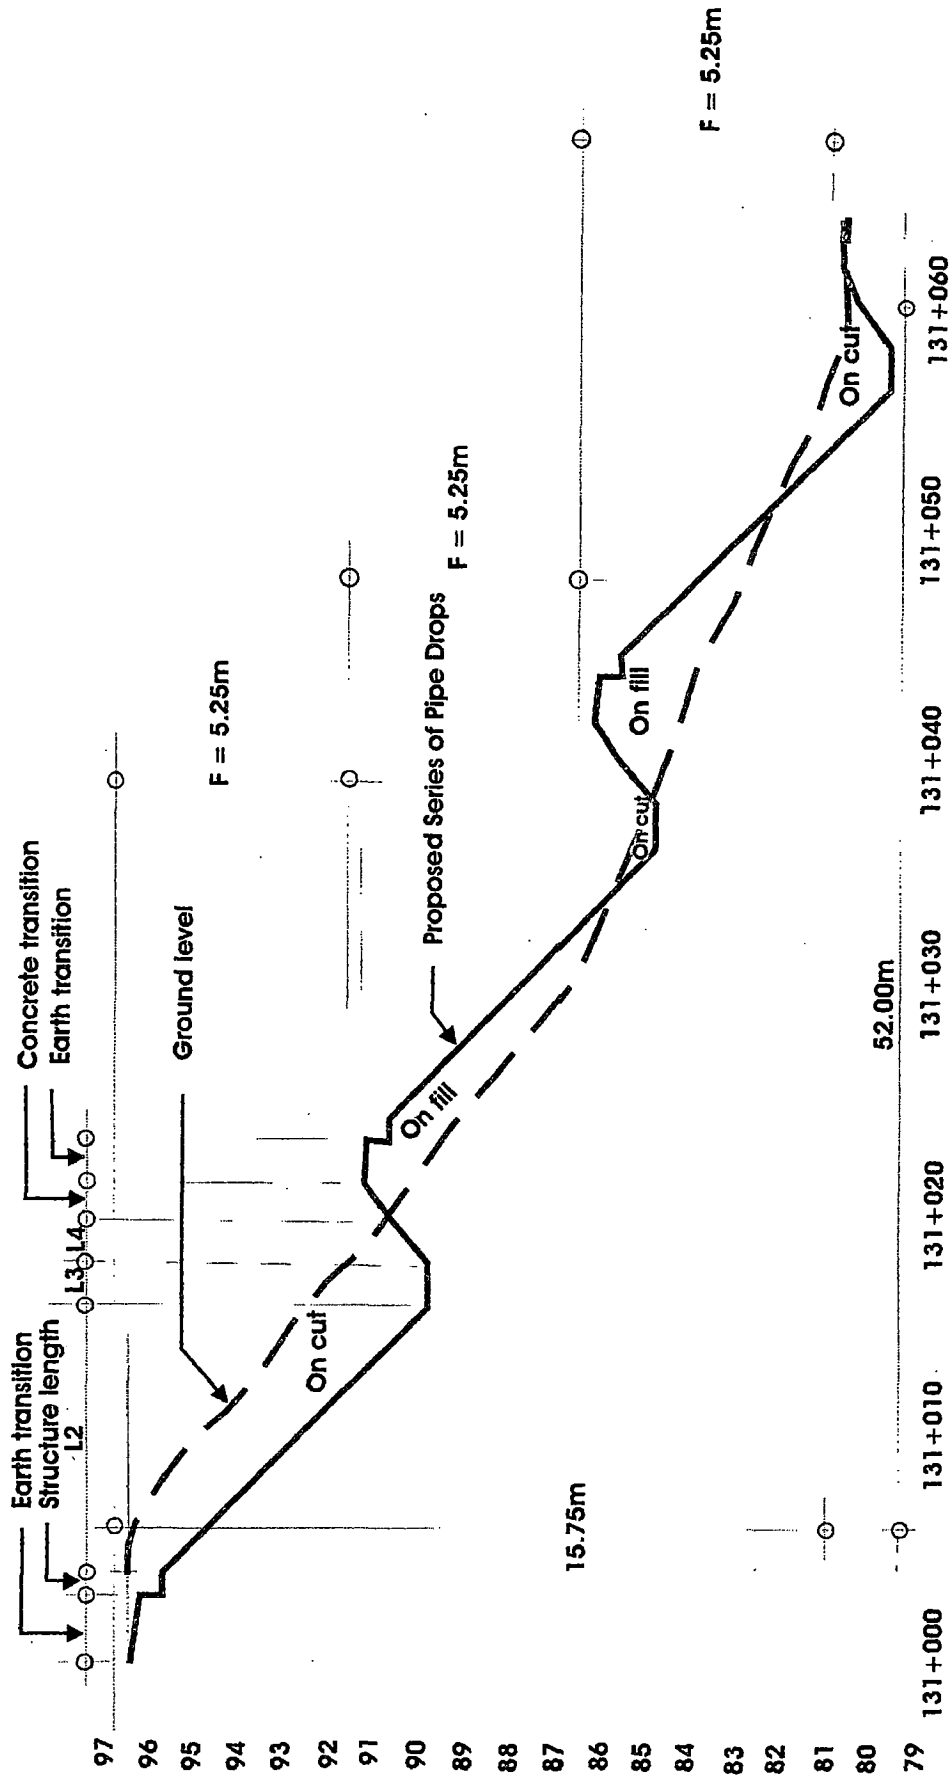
Proposed Series of Pipe Drops Alignment
